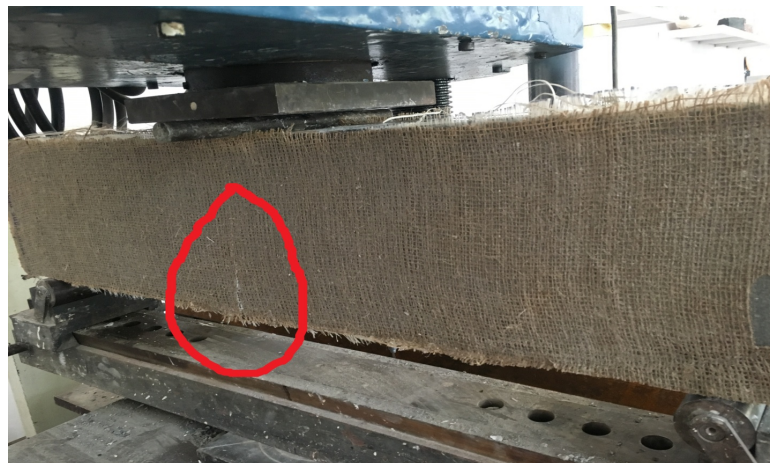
4 : Showing single ultimate load crack of SW-B1 with Type-1 layering scheme
